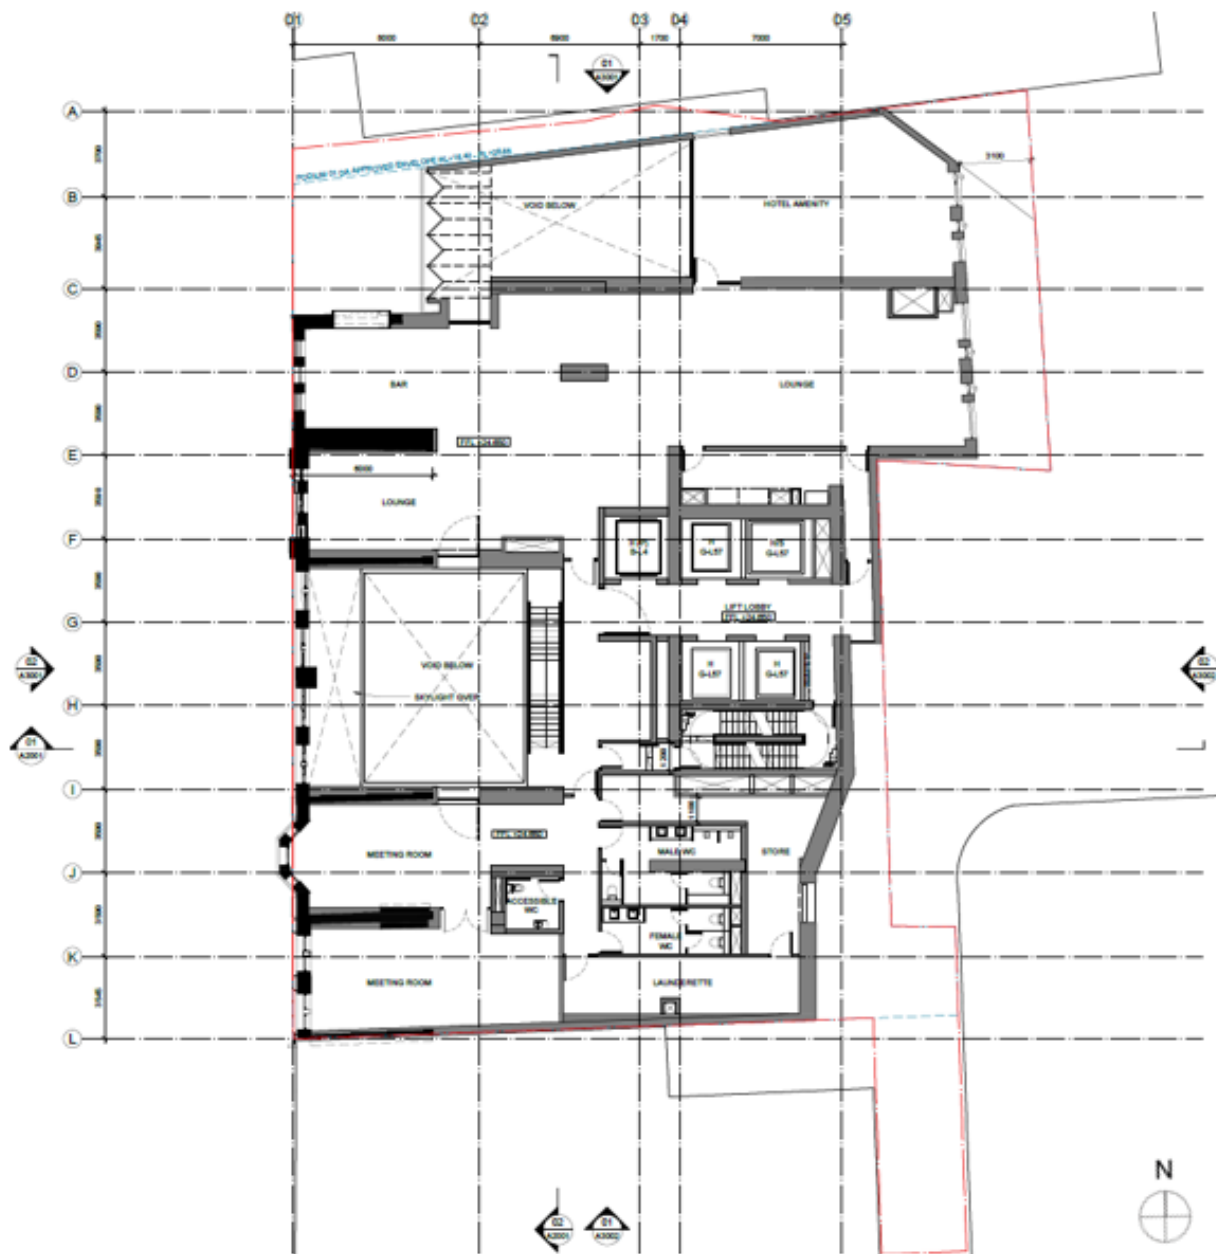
| Proposed basement floor plan (Source: RtS architectural plans)
